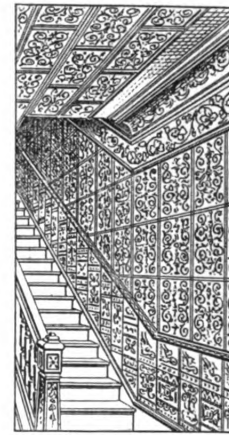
Stairway Decoration in Combination with Ceiling and Side Wall.
